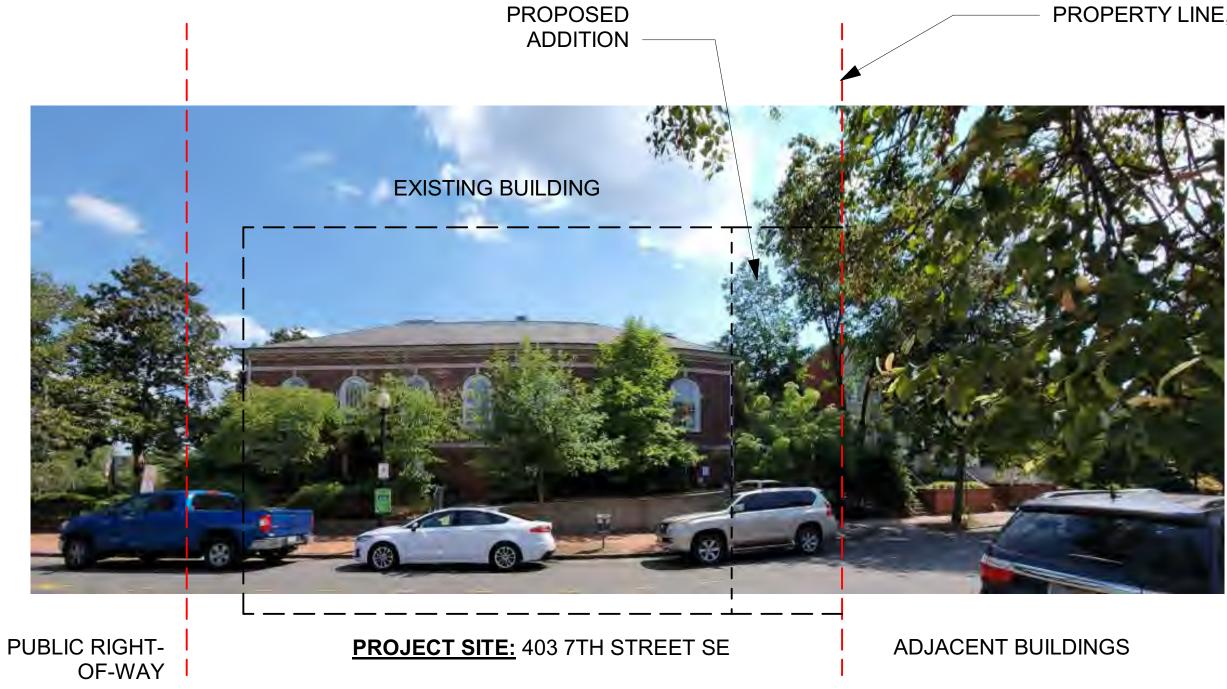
### PHOTO - VIEW FROM SOUTH CAROLINA AVENUE SE
